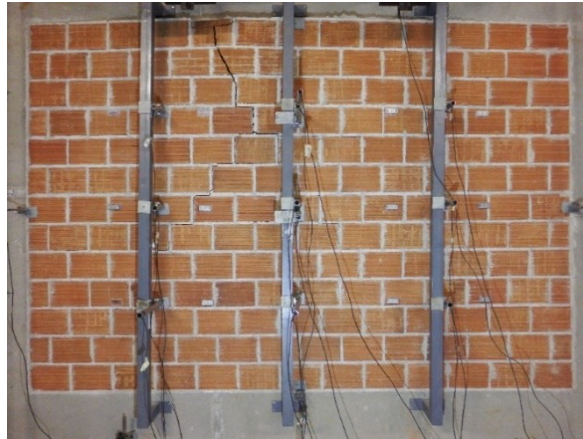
Final cracking pattern of the specimen SIF-O-1L-A
